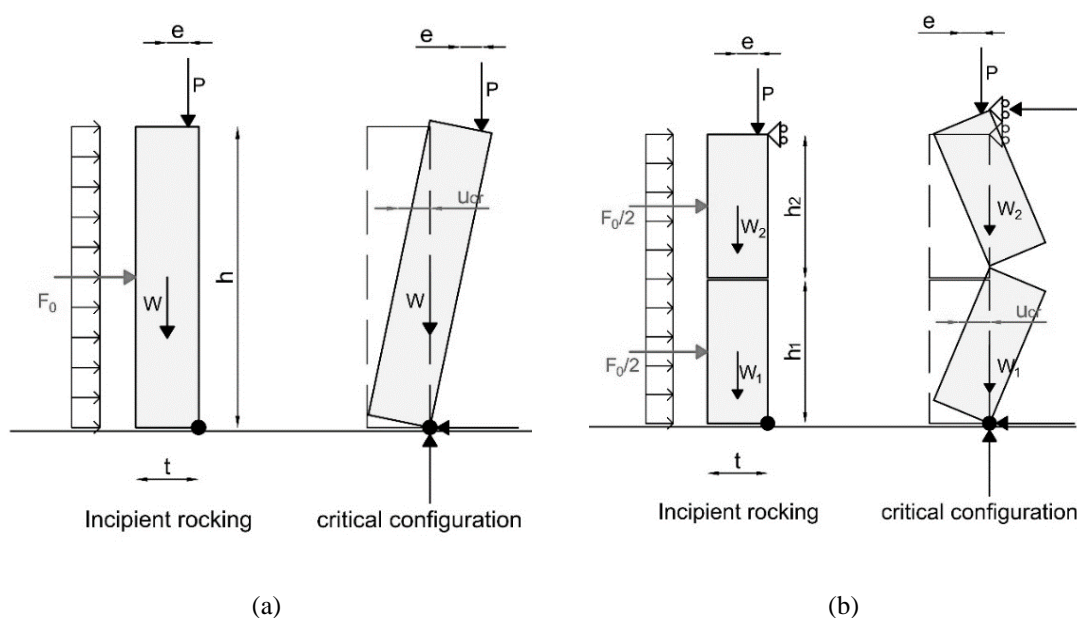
Rocking masonry walls: (a) Parapet Wall (PW) and (b) Simply-Supported Wall (SSW)
